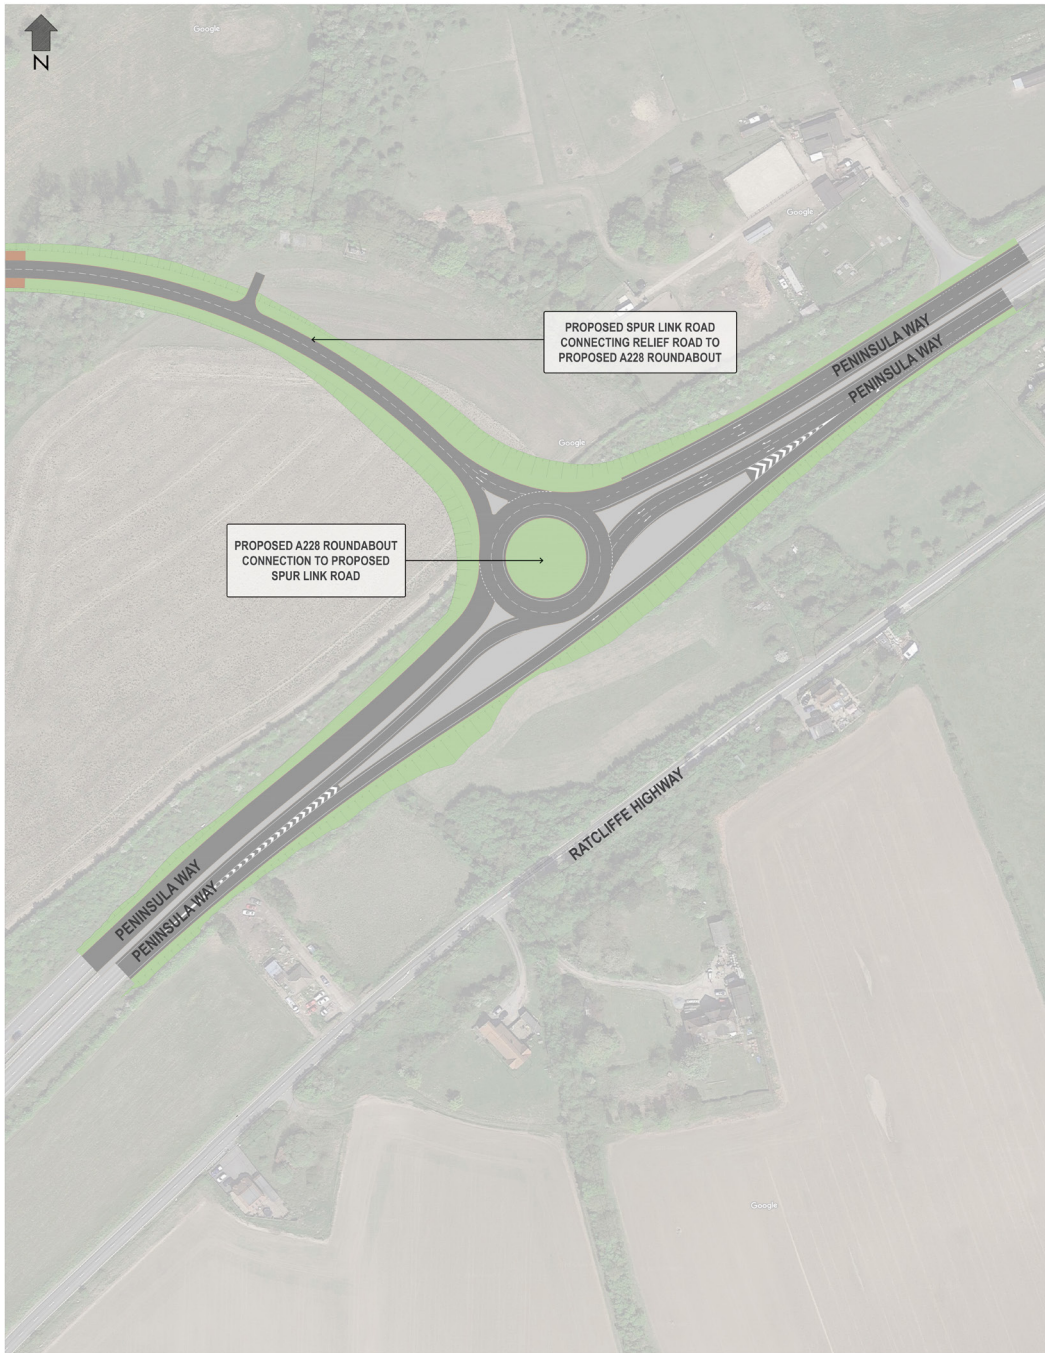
shows the proposed spur link road and its intersection with the A228 Peninsula Way where a proposed roundabout will be introduced between Main Road Hoo and Bell's Lane (Alignment A).
